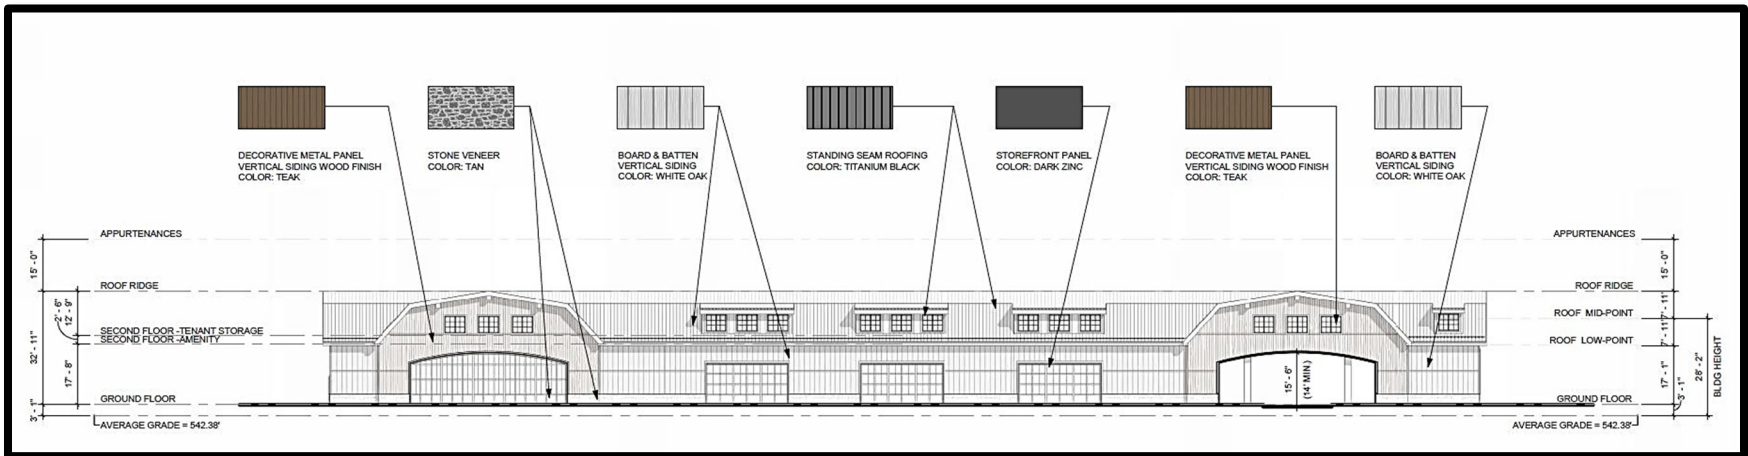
Amended West Elevation – Residential & Accessory Standalone Building
